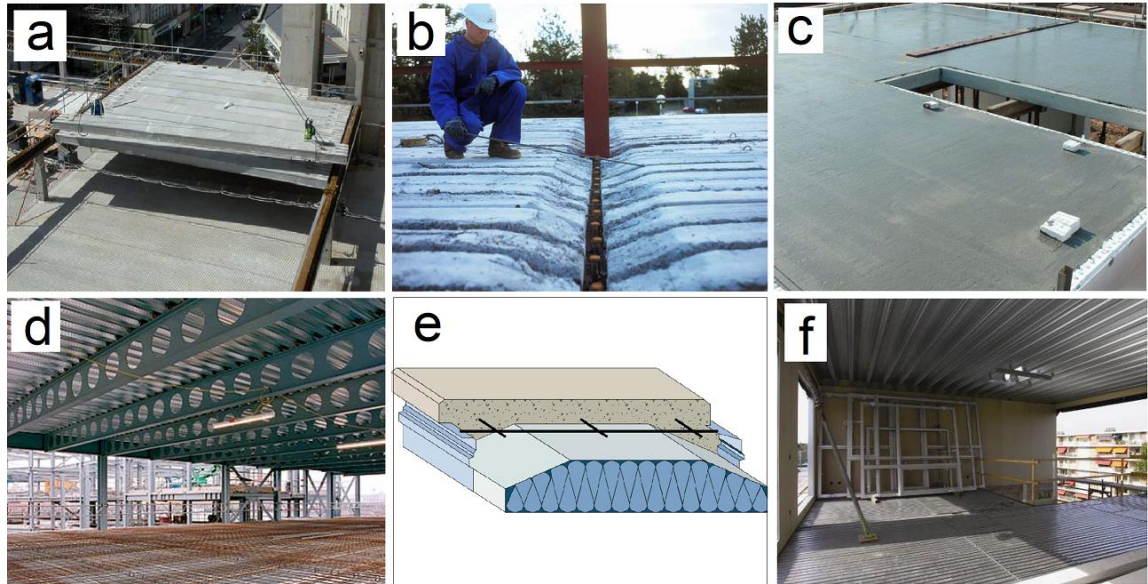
The most common structural floor solutions in metal frames: a – non-composite prefabricated concrete slabs; b – composite prefabricated concrete slabs (Arcelor Mittal & Peiner Träger 2008b); c – cast-in-place concrete slabs; d – cast-in-place concrete slabs with steel decking; e – prefabricated composite slab element; f – dry floor (SCI 2008).
